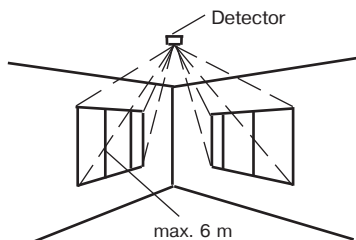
Installing the Detector on the Ceiling (for window openings in the neighboring walls monitoring)
